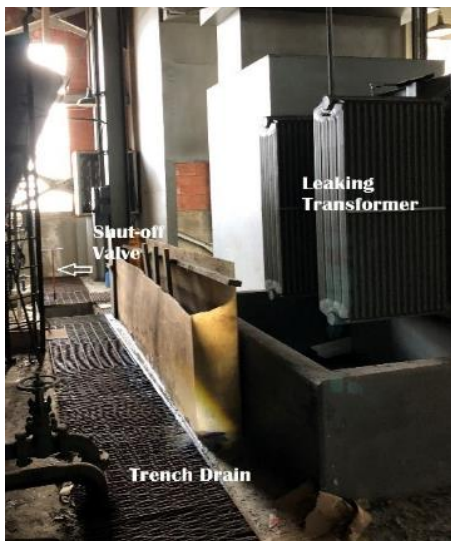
View of transformer, trench drain, and drain shut-off valve.
